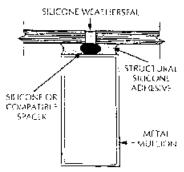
EXAMPLES OF TYPICAL GLAZING DETAILS
